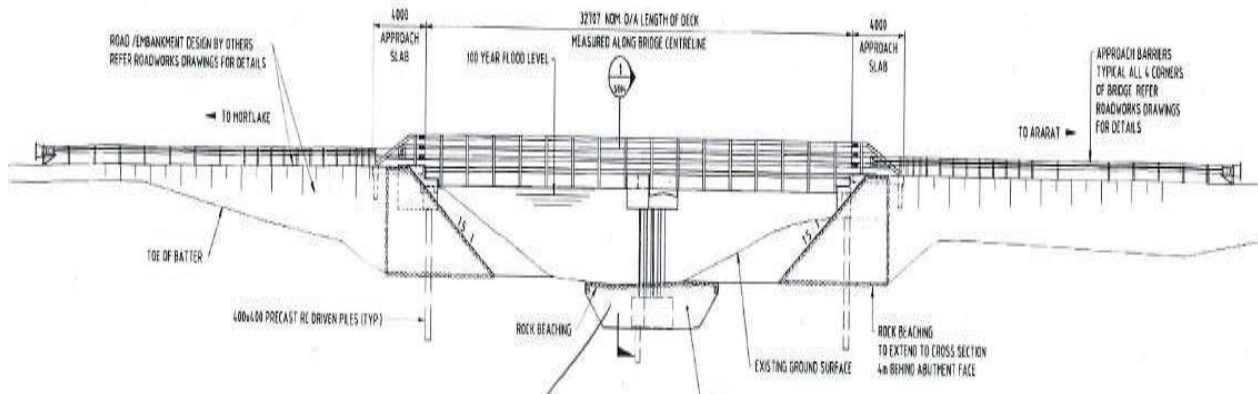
A beautiful thing and a joy to behold. A brand new 32.7m long bridge made up of 2 spans, with each span consisting 16 x 600mm x 600mm pre-cast concrete planks.
